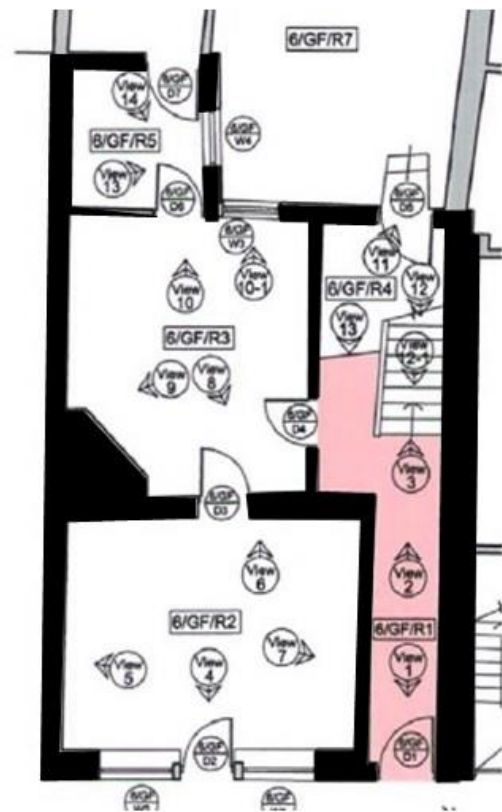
Ground floor plan drawing of No.6 Parkgate Street reproduced from Ryan, C. (2018) Appendix A:
